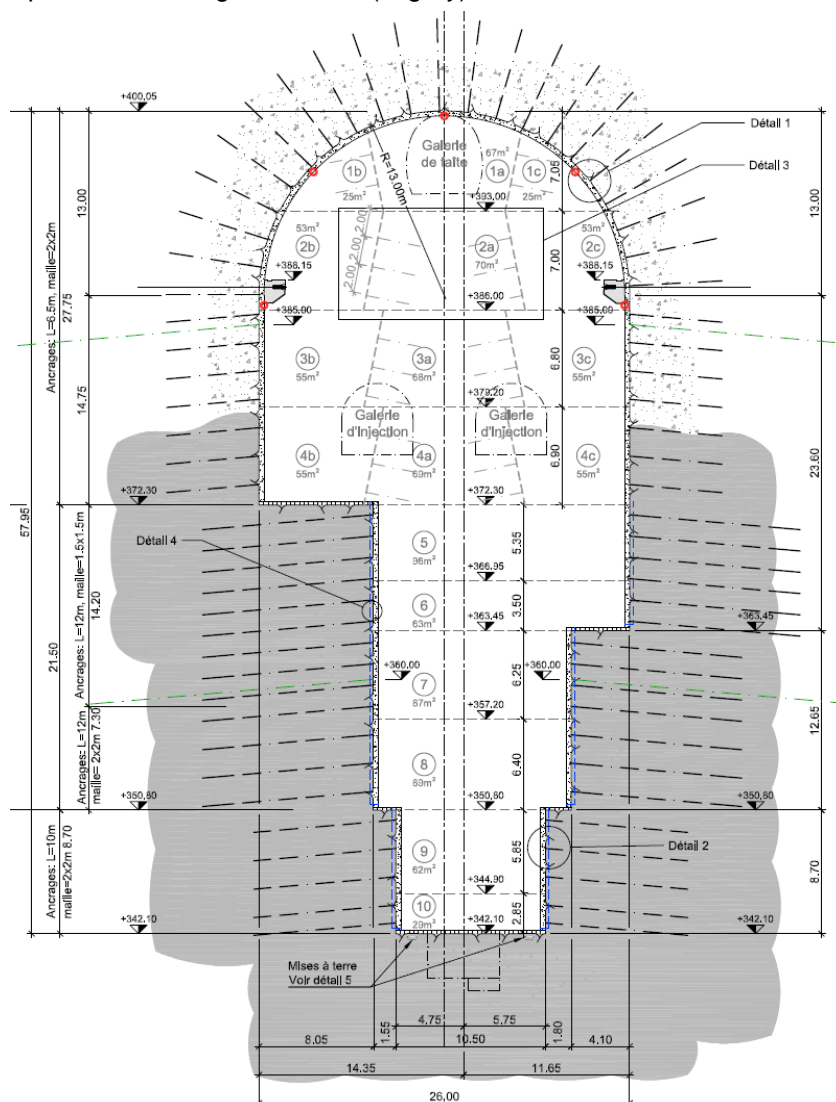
Cross-section of the new powerhouse of Veytaux 2
